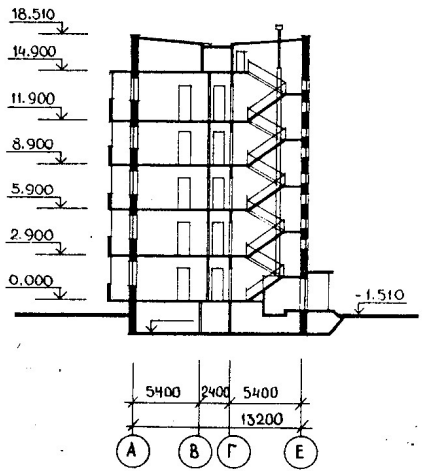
A: Critical Structural Details- Elevation of a Typical Large Panel Building
